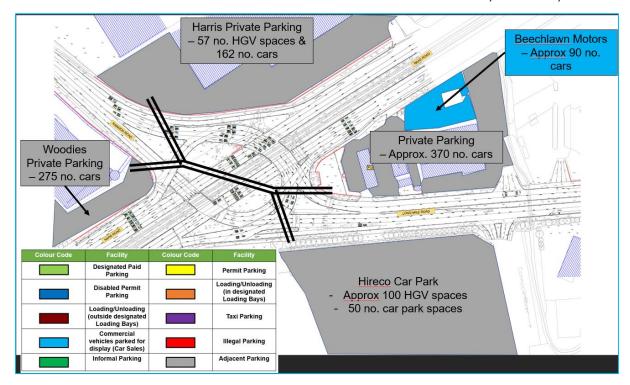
New Nangor Road / Naas Road / Long Mile Road Junction Parking Facilities
